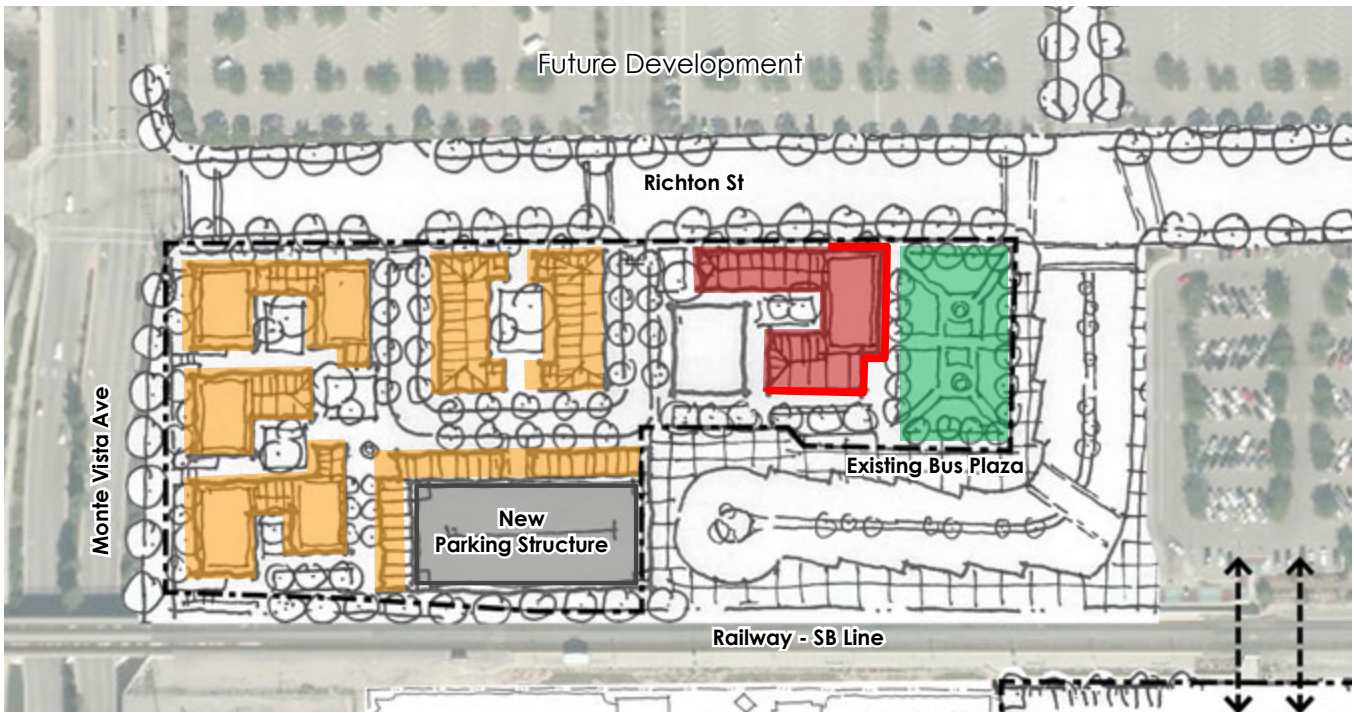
ILLUSTRATIVE SITE PLAN FOR CALTRANS PARKING LOTS AND CITY/SANBAG LAND (ALTERNATIVE A-1)
